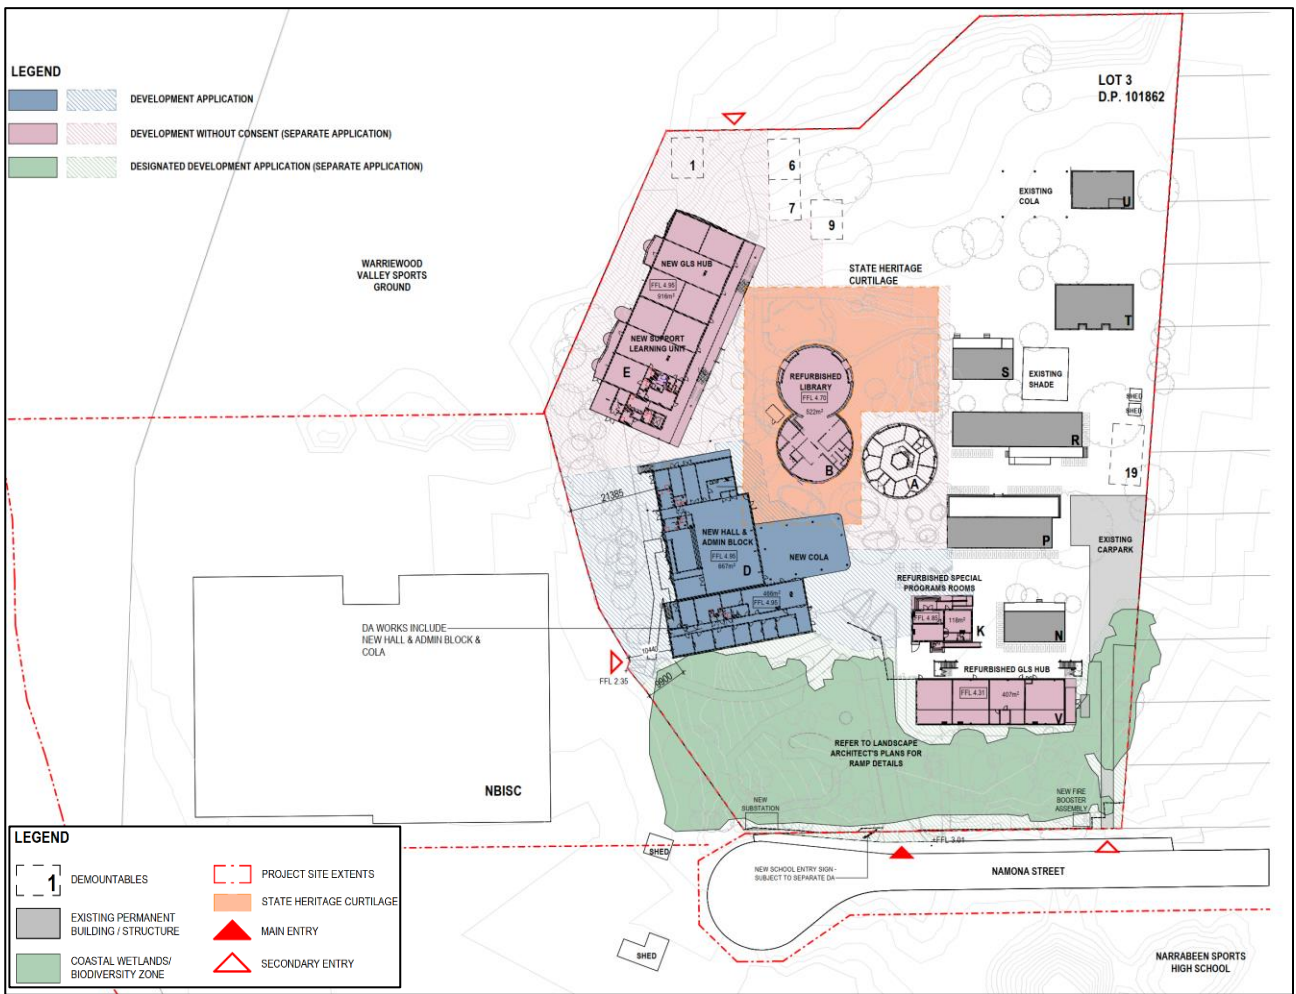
Proposal Architectural Site Plan (received 23 August 2022)
